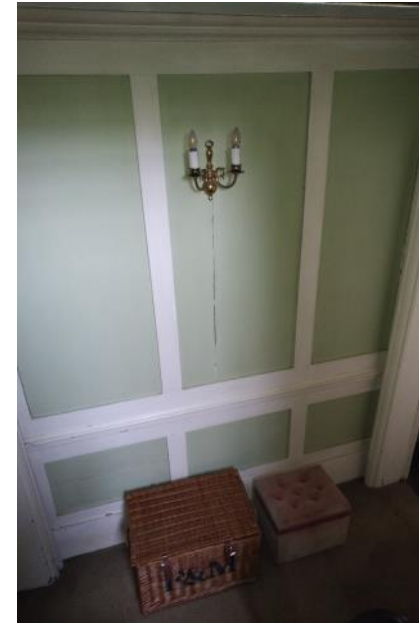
The panelled wall on the southern side of the Main Staircase Hallway.
